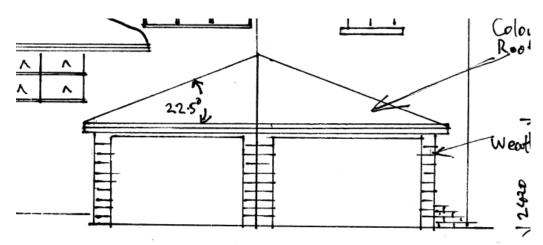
Proposed weatherboard garages with shared party wall, to be constructed at the new boundary line.
